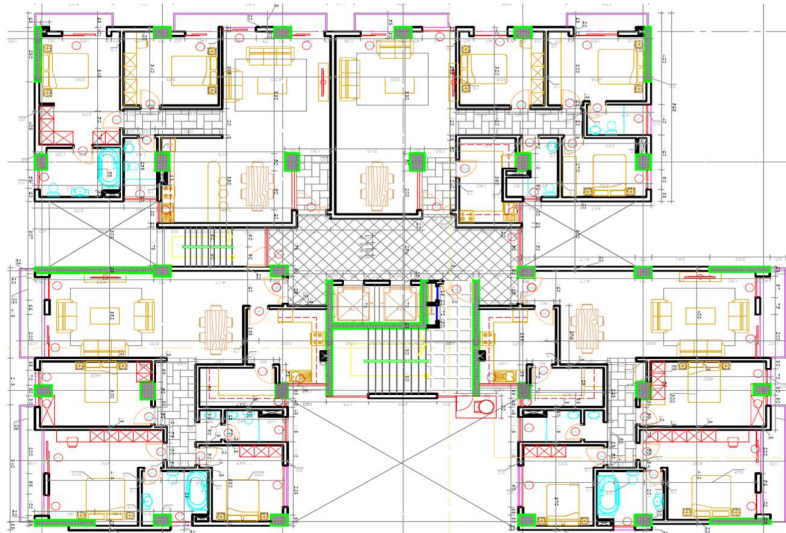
PRD-05 Real Estate Bole Site Floor Plan
